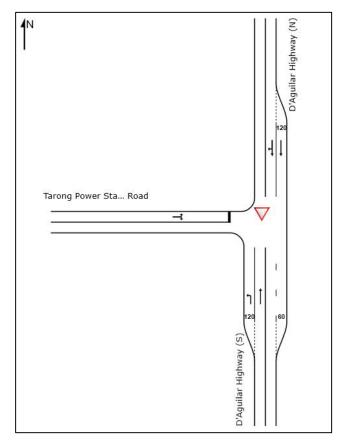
SIDRA intersection layout - D'Aguilar Highway / Tarong Power Station Road
